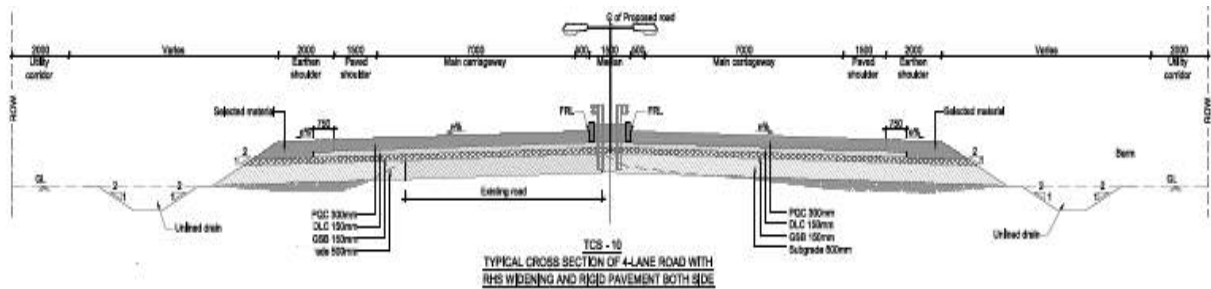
TCS-10 4-lane road with RHS widening and rigid pavement both side
